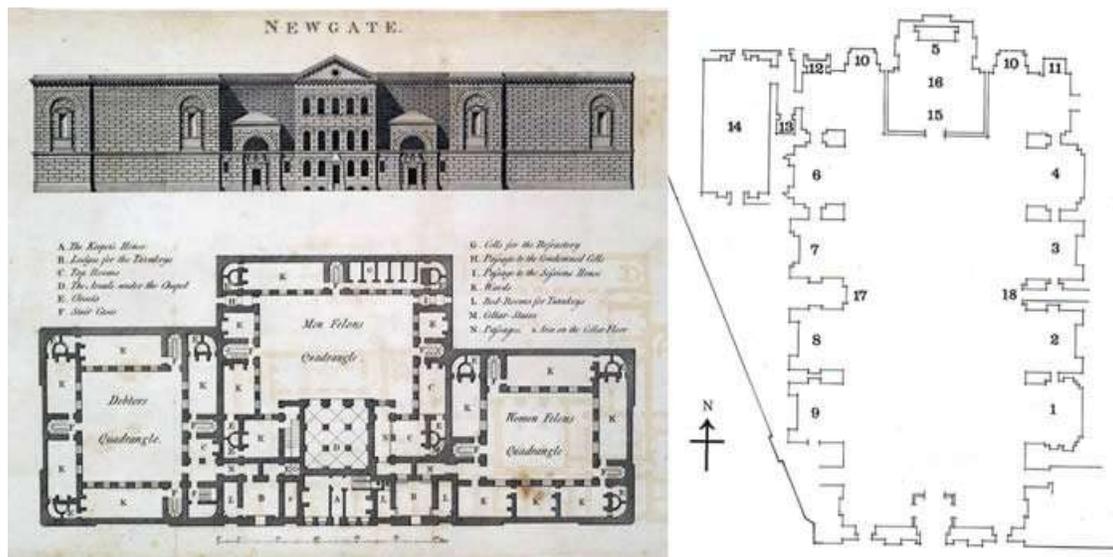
Architectural plans for New gate prison, London c.1800 (left) and church of st.Loch, Lisbon c.1578 (right). (Niyi, 2017).
